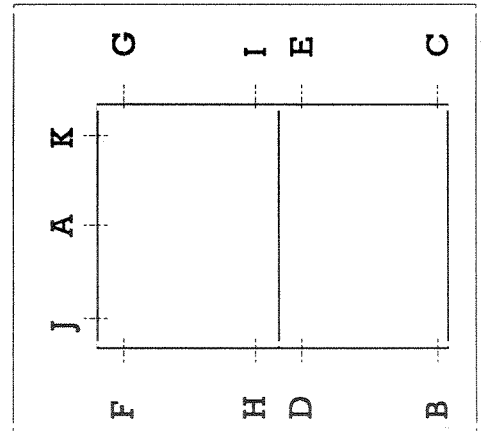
CONCRETE SCREW FASTENER LOCATIONS FOR WINDOW FRAME TO CONCRETE BLOCK
